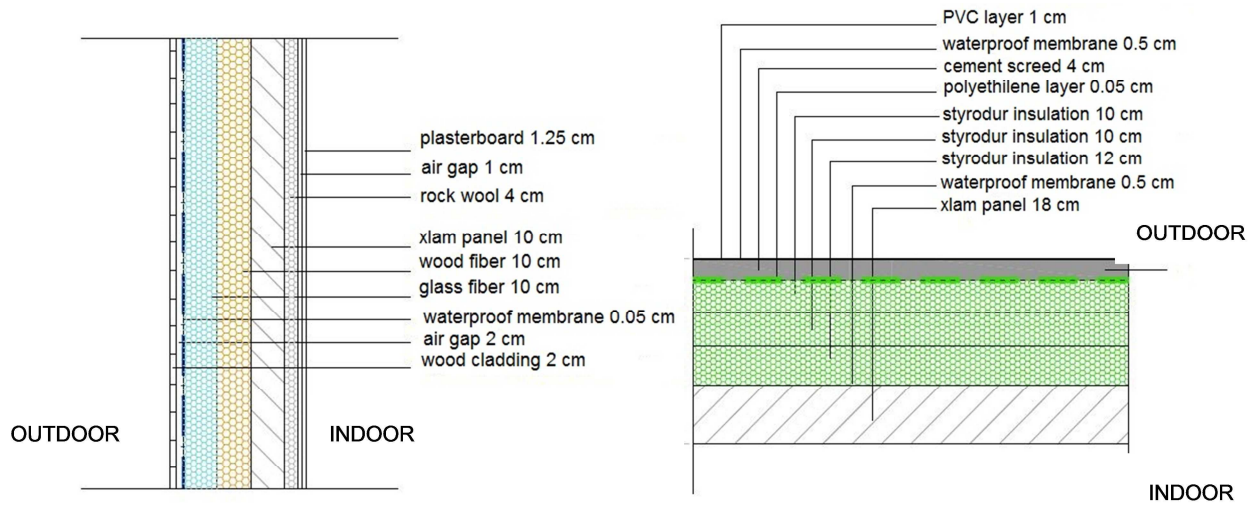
Construction layers of the external walls (on the left) and of the roof (on the right)
